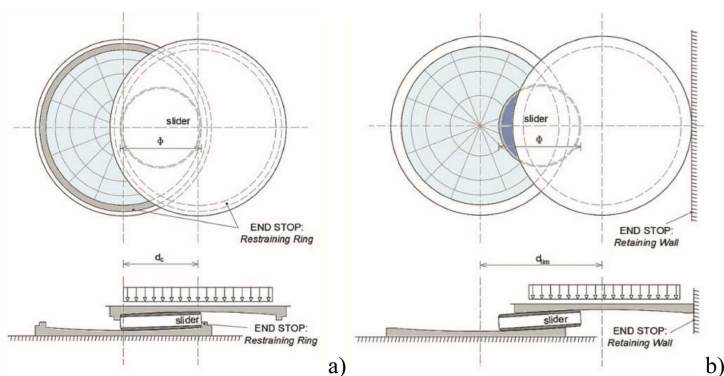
DCCSS bearing in deformed condition a) with a restraining ring  $d_c$ ; b) with overstroke capacity and retaining wall  $d_{lim} \geq d_c$ ; in plan and cross section view (Di Cesare et al. 2021).
